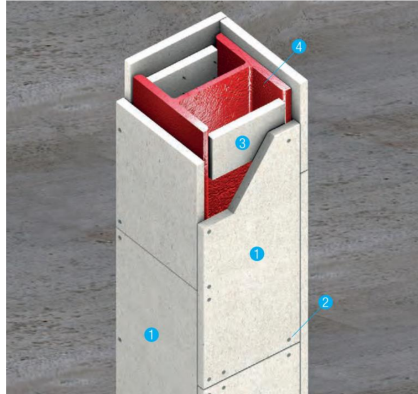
Steel column with PROMATECT®-200 and reinforced joints.
